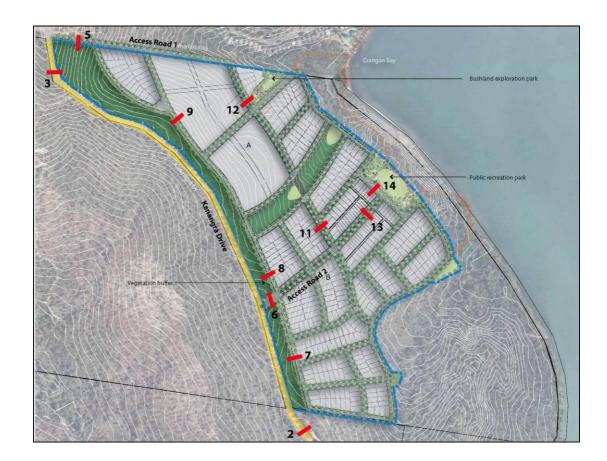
Area of influence of Coal & Allied Gwandalan concept plan showing traffic forecast locations (indicative layout)
